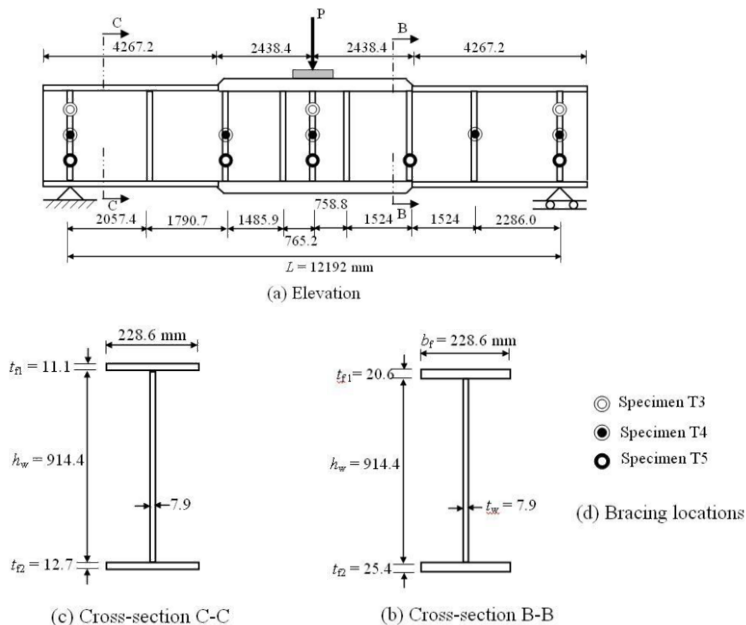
General layout of the full-scale plate girder bridge tests (T3-T5) tested by Felkel et al. [4].
